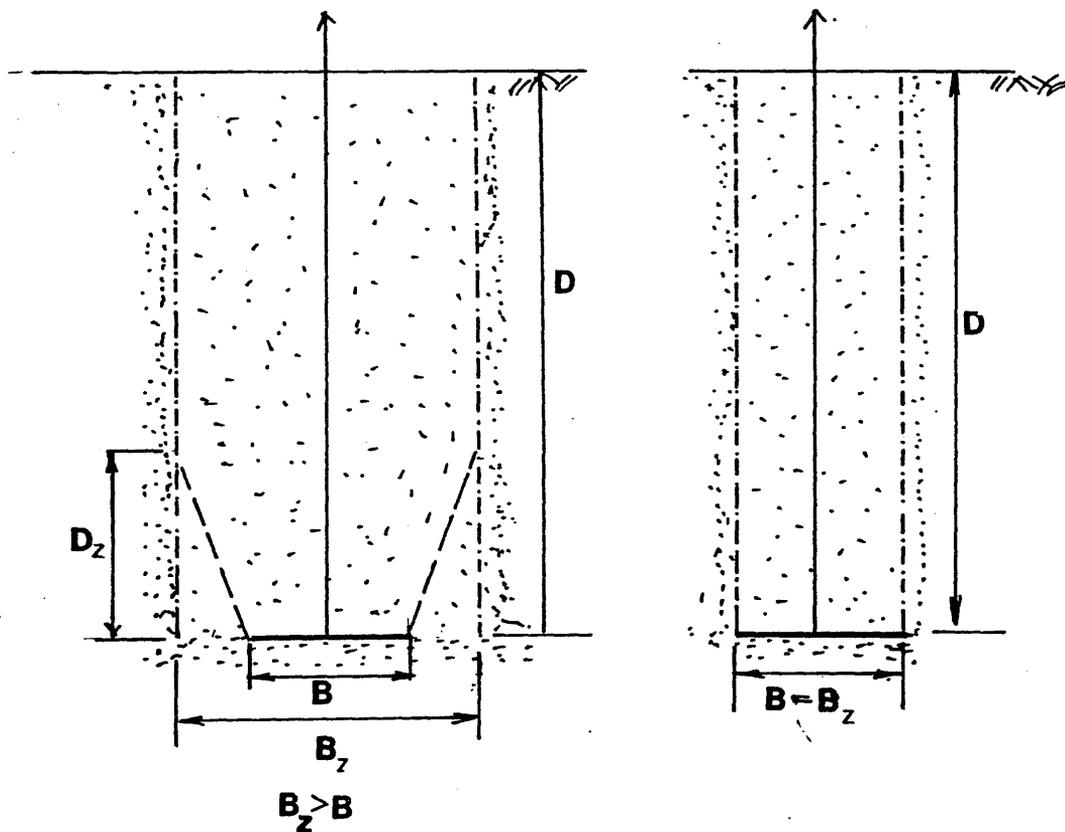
Suggested Failure Surface in Disturbed Zone
